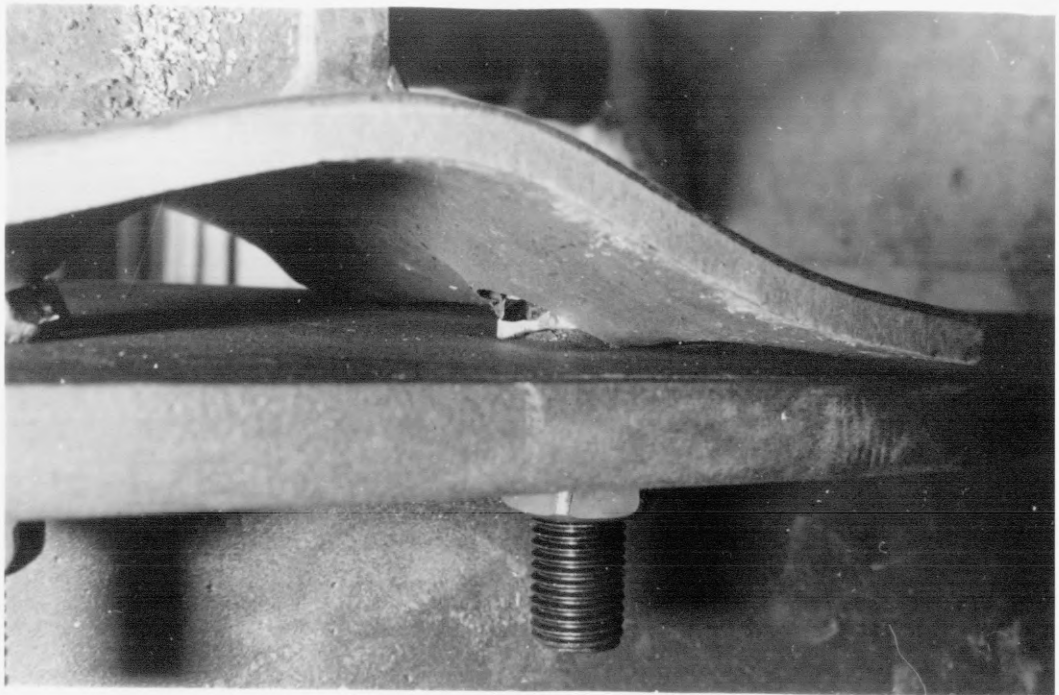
Bolt punching through end plate around the inner tension bolts
